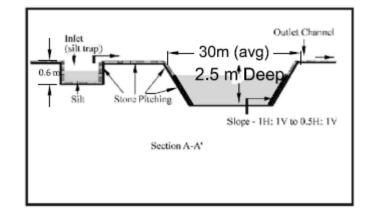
TYPICAL SECTION OF CHECK DAM
